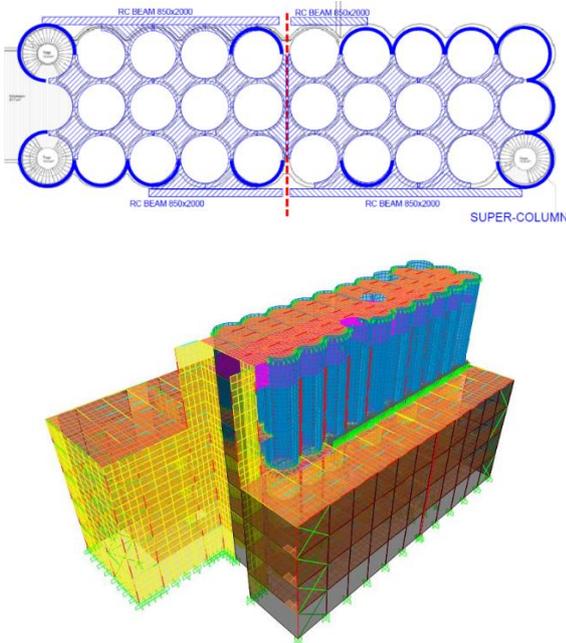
Plan of the diaphragm slab and F.E.M. view.
